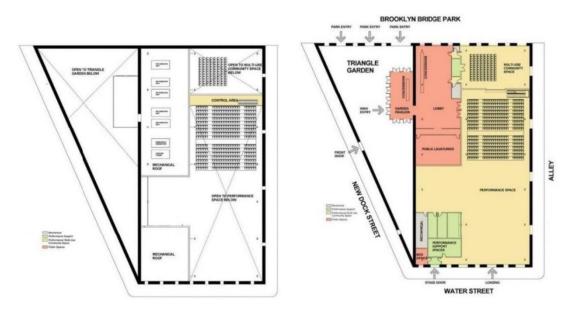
Tobacco Warehouse plans (Sarah, 2017).
